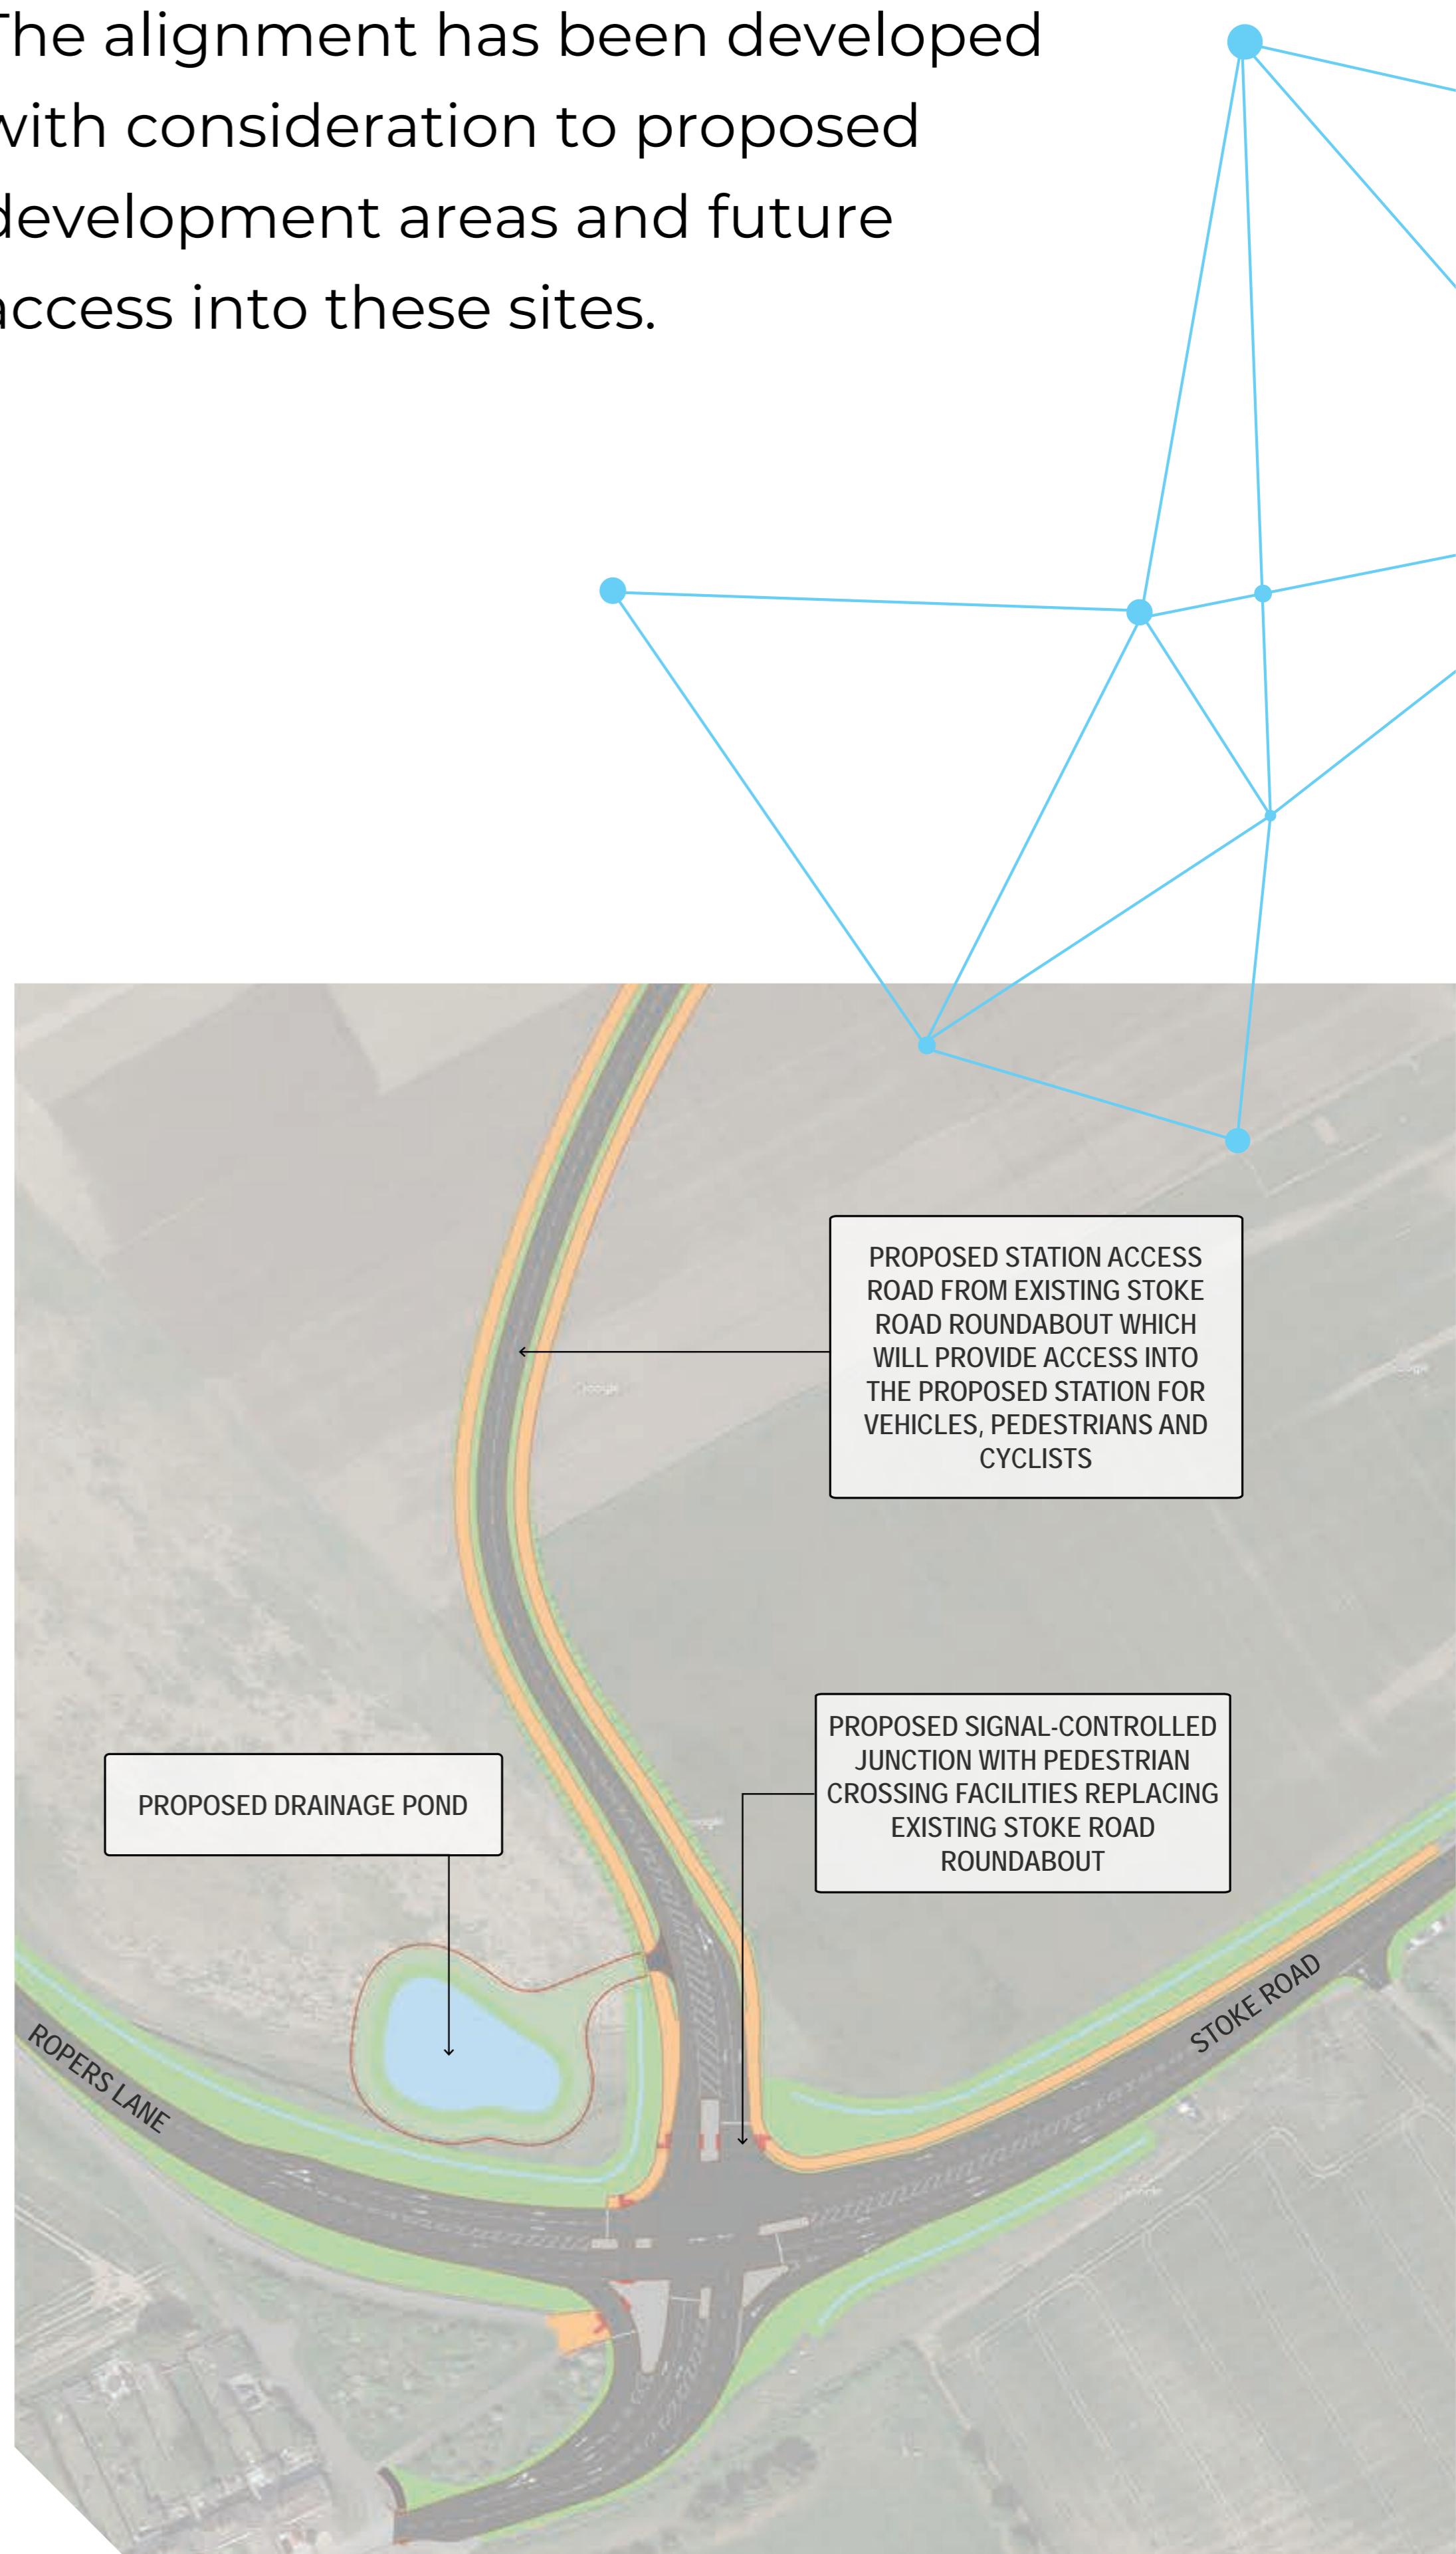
shows the road alignment to the proposed Railway Station. The alignment has been developed with consideration to proposed development areas and future access into these sites.
